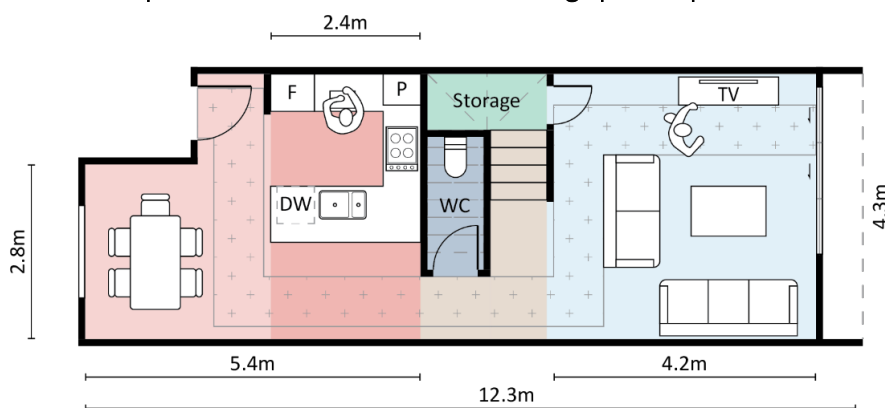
Example of an open floor plan where the kitchen, dining space and lounge are in one space
